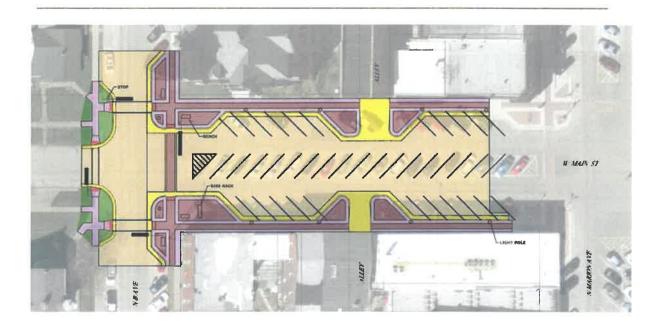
W. Main Street Area Downtown Streetscape Concept Plan
